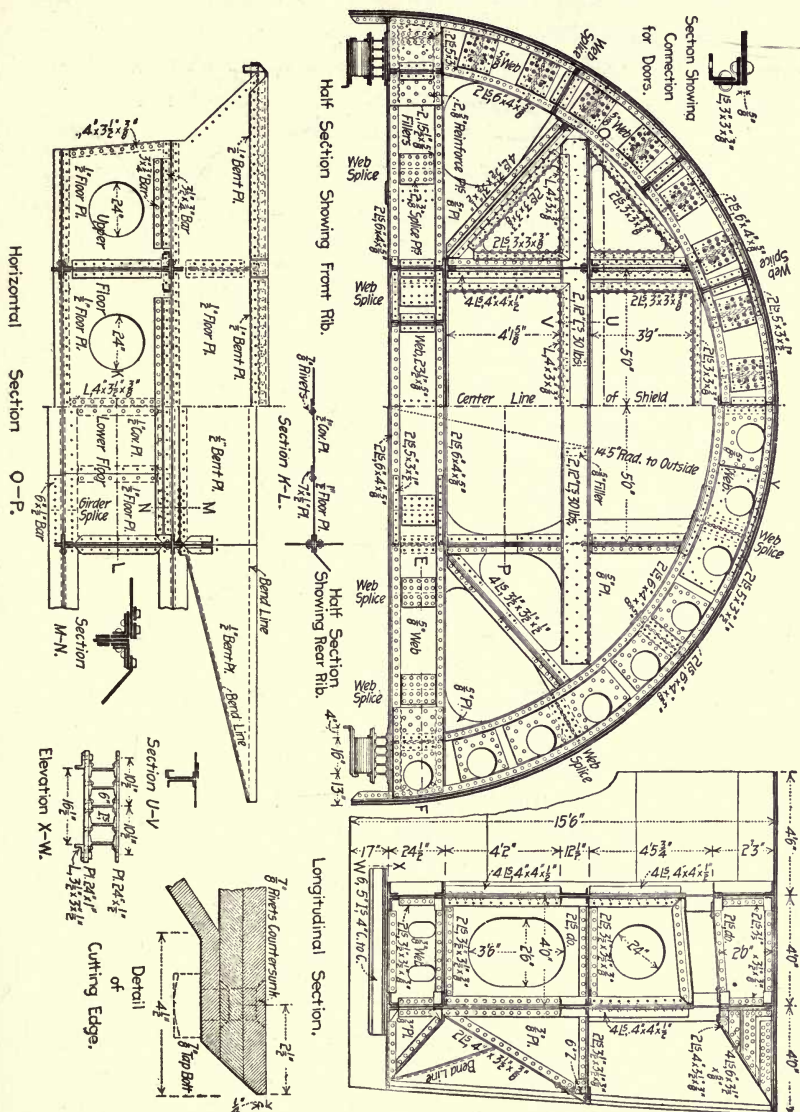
Roof-shield, Boston Subway, East Boston Extension; Front and Rear Rib and Longitudinal Section.
